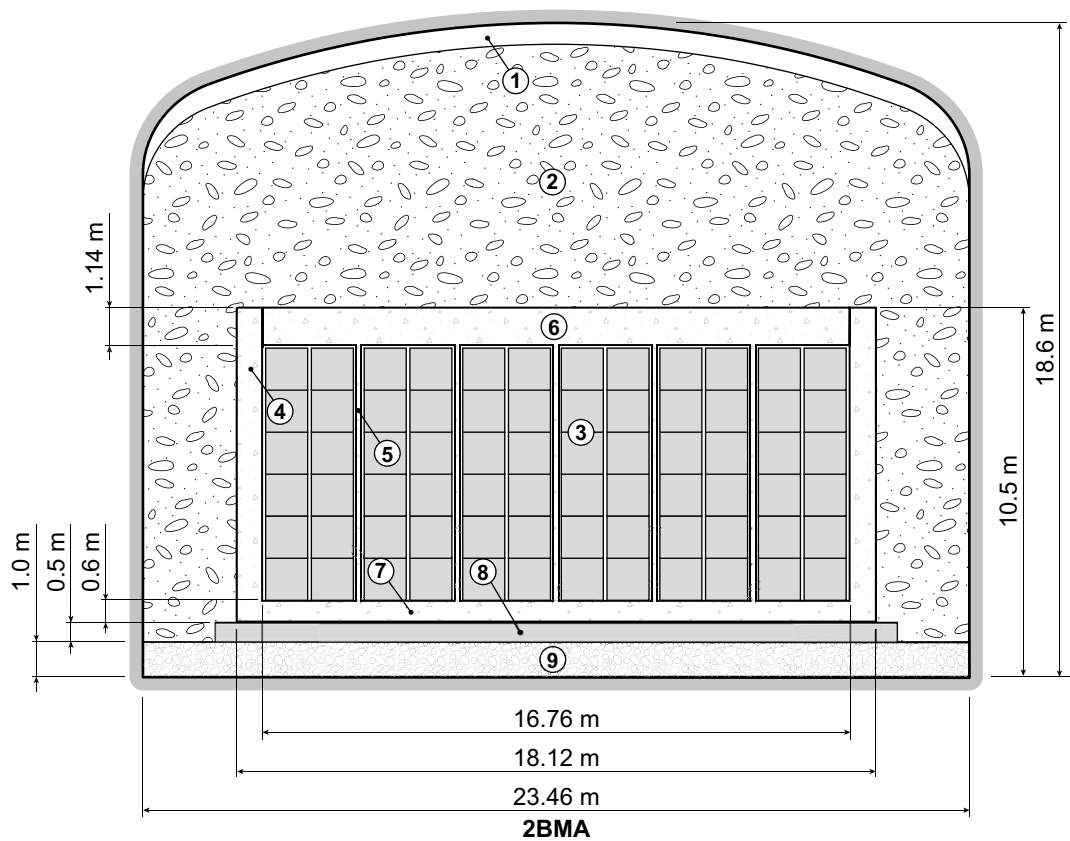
Schematic cross-section of 2BMA post-closure. Key to numbering: 1) Void 2) Macadam backfill 3) Waste domain 4) Outer wall 5) Inner wall 6) Lid 7) Caisson slab 8) Slab 9) Crushed rock.
